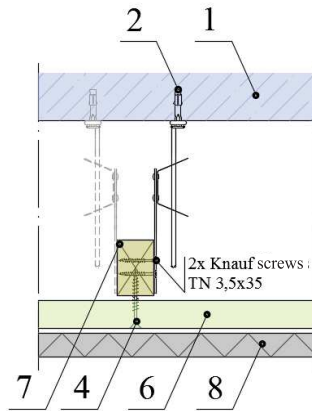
Fastening of load-bearing laths 60x40 or 60x30mm onto the load-bearing slab structure.
